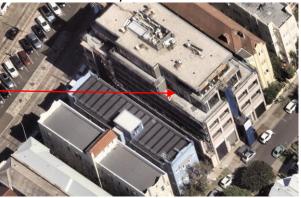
Areal view of the eastern side elevation of the subject site and the location of the proposed works.
